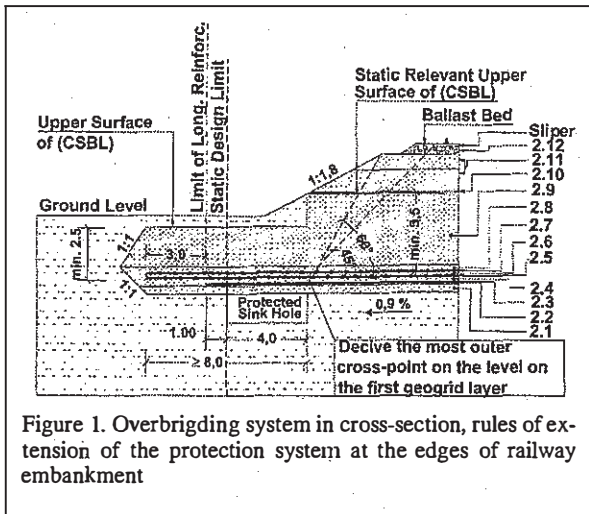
Overbridging system in cross-section, rules of extension of the protection system at the edges of railway embankment
